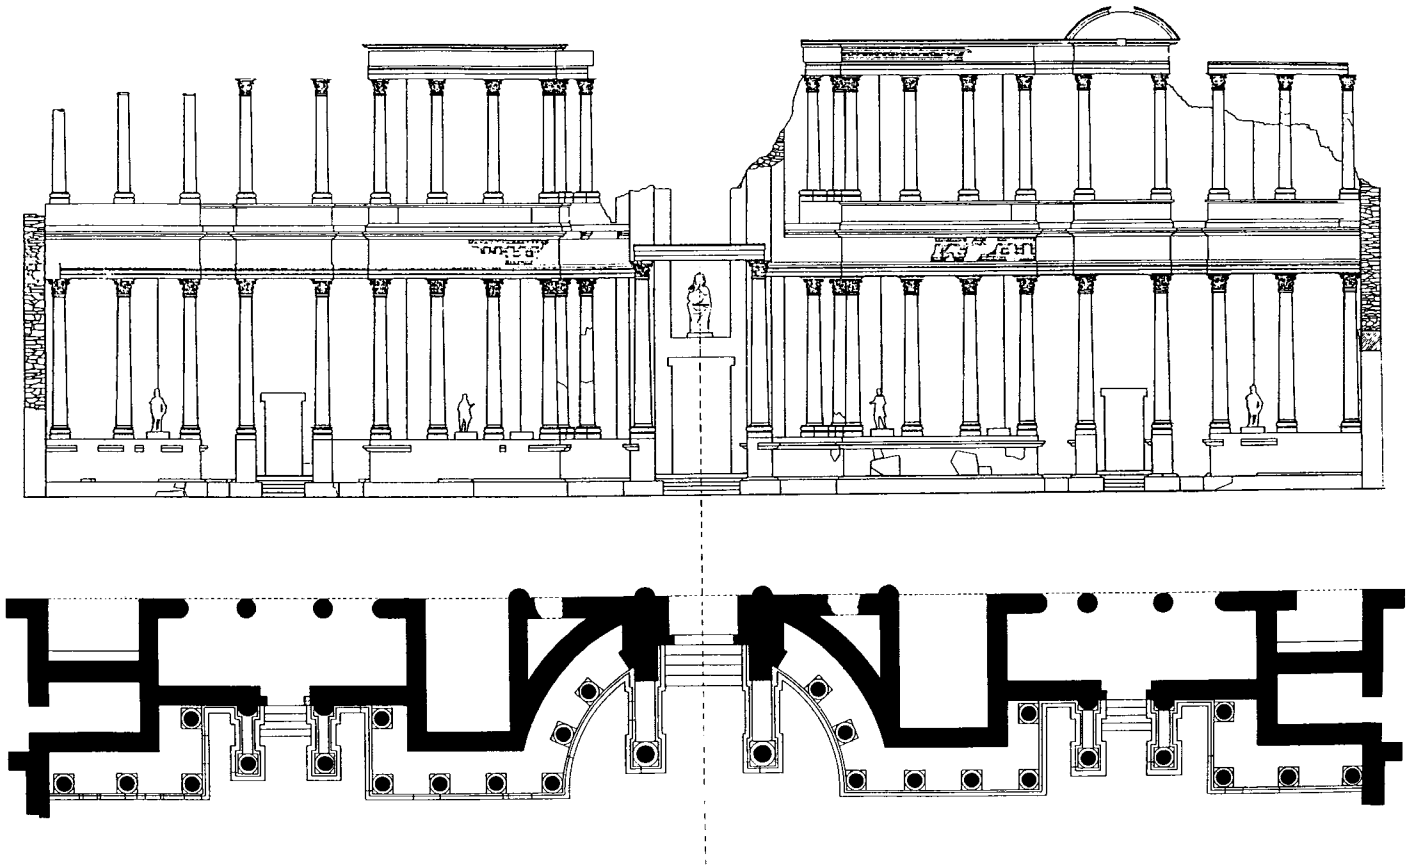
Augusta Emerita, elevation and plan of the *scaenae frons
